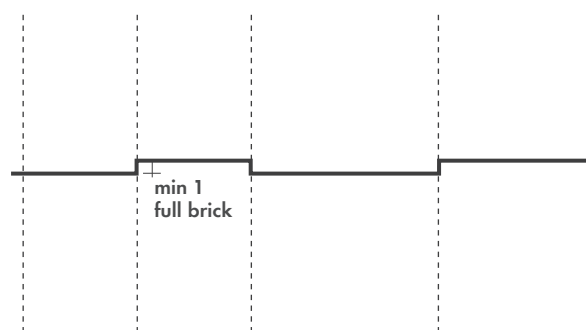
Diagram showing facade bays articulated in plan as well as elevation
